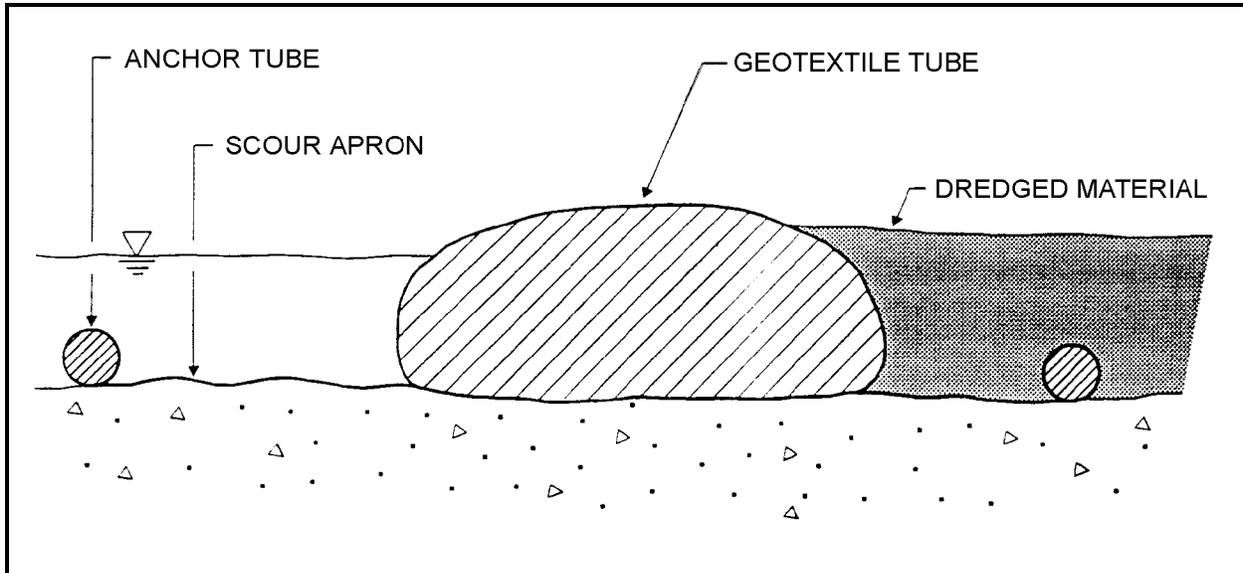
Schematic cross-sectional view of a geotextile tube retaining and protecting dredged material
